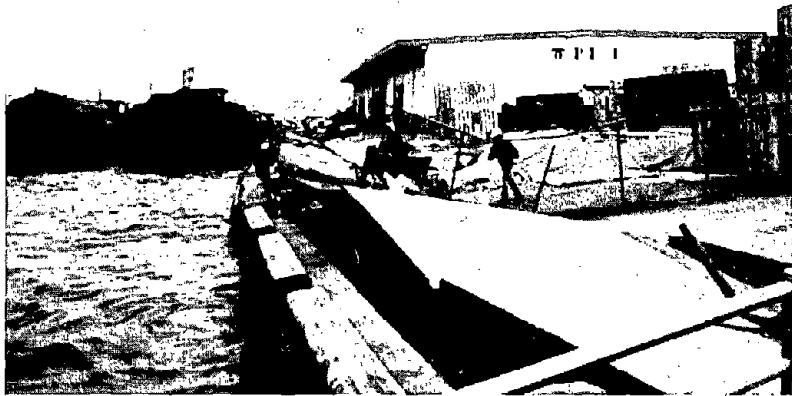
Extensive lateral spreading, ~2 m, and associated settlement exposed warehouse foundation piles on Port Island.
